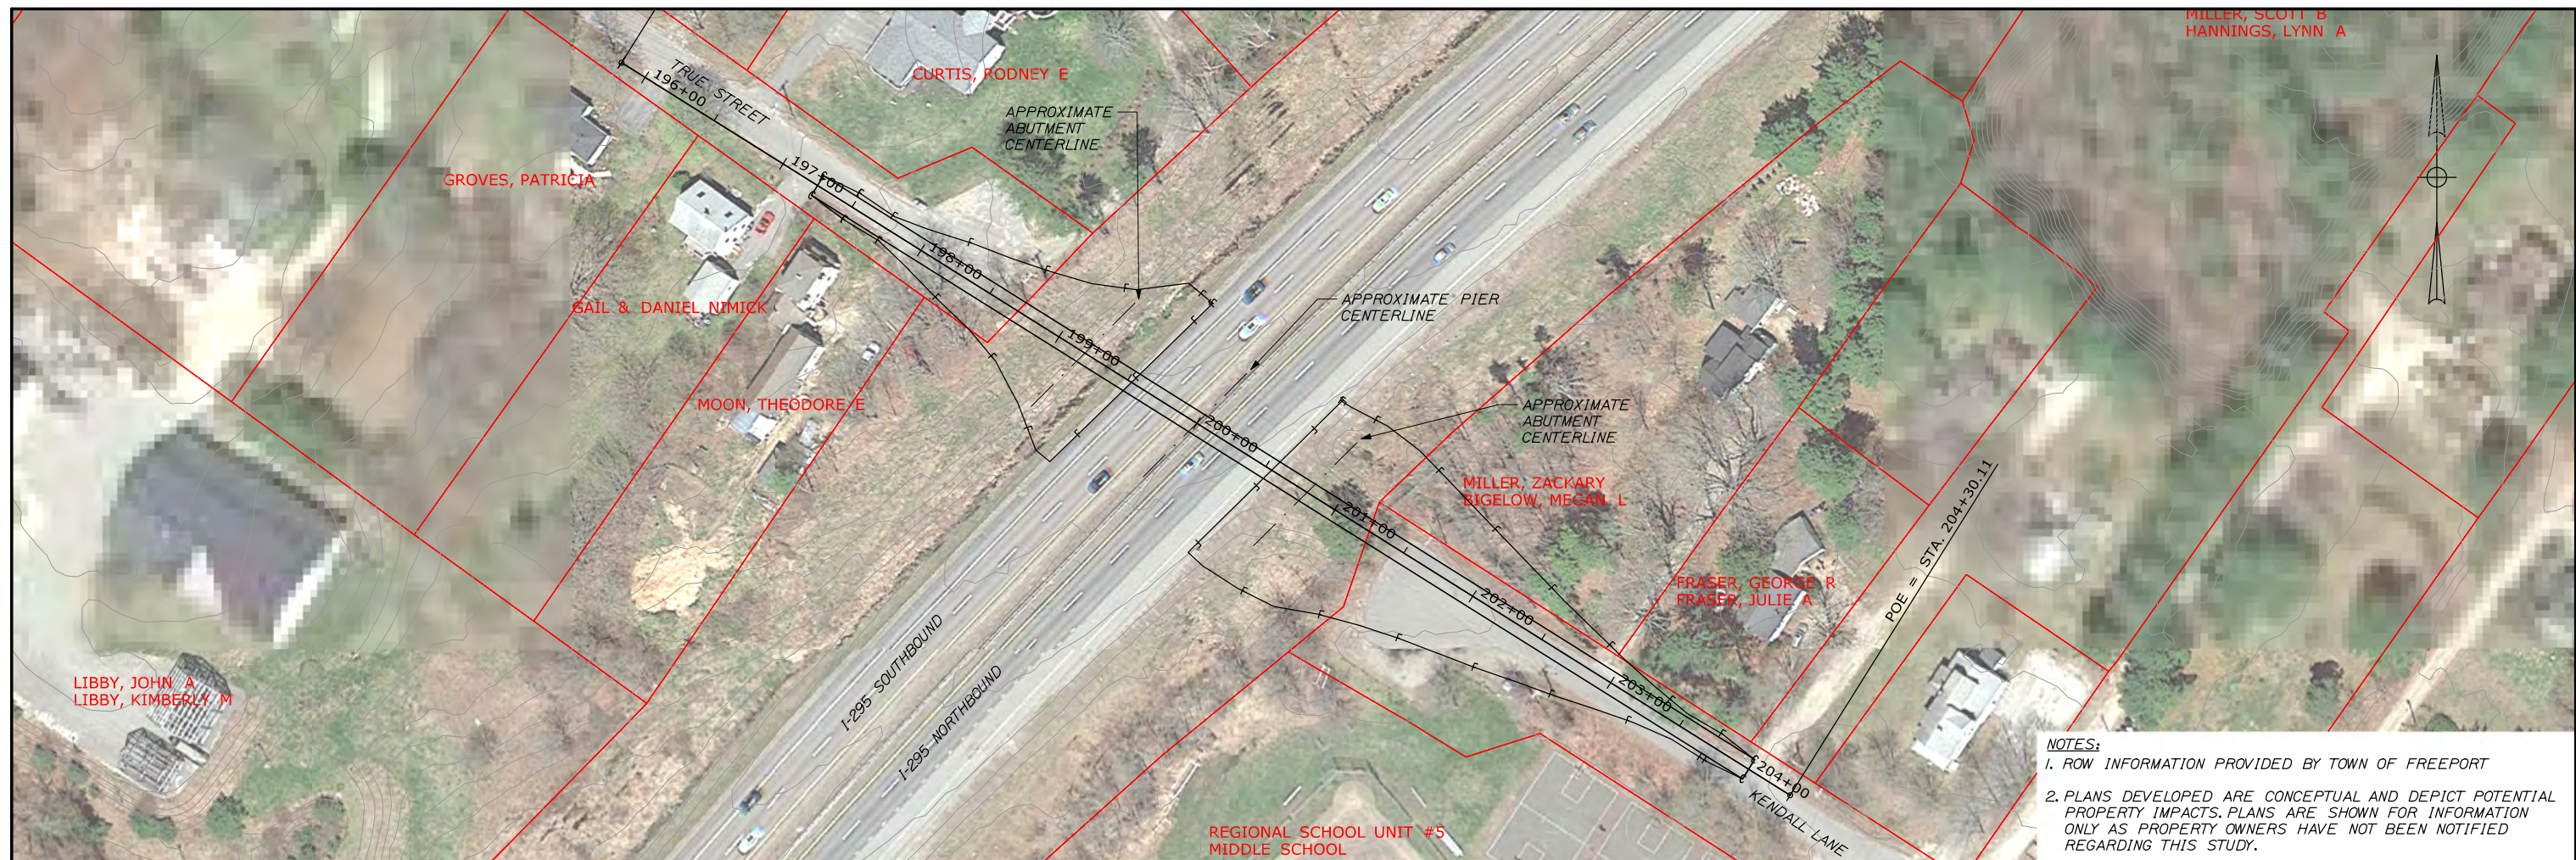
POTENTIAL BRIDGE LOCATION H
